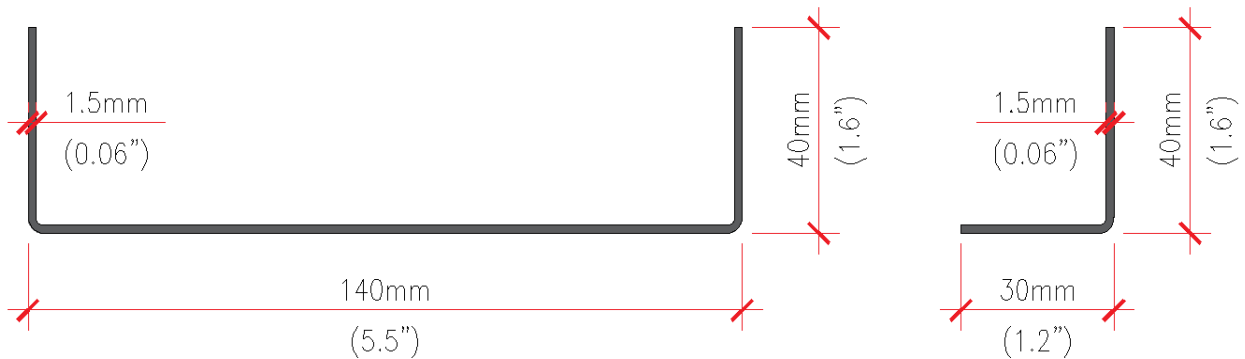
Galvanised steel profiles (Alternative)
